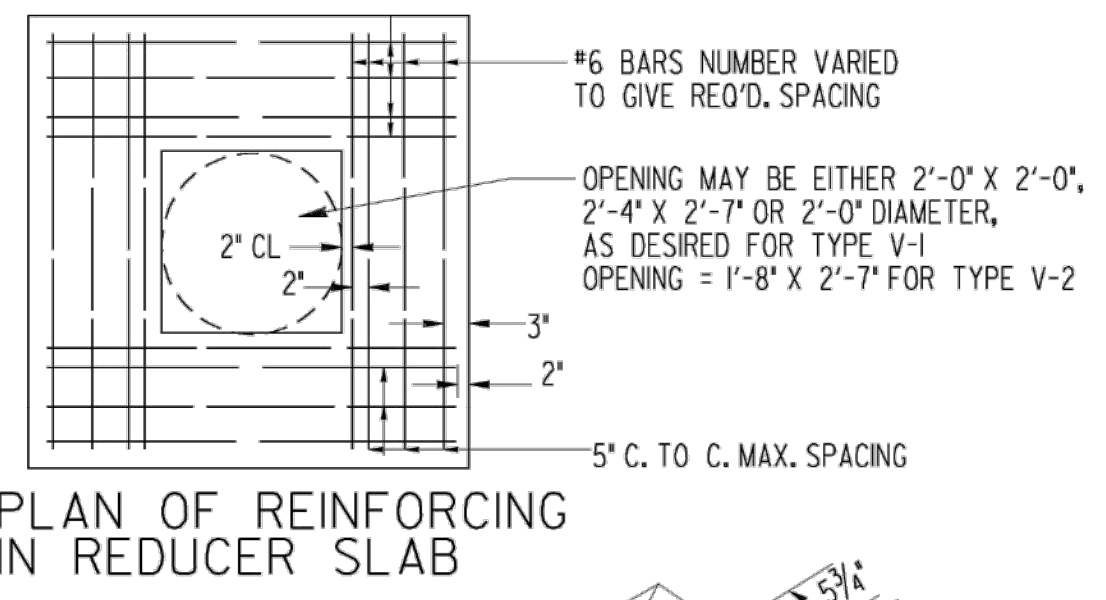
DETAIL OF REDUCING W1 OR W2 DIMENSIONS WITH REDUCER SLAB.
